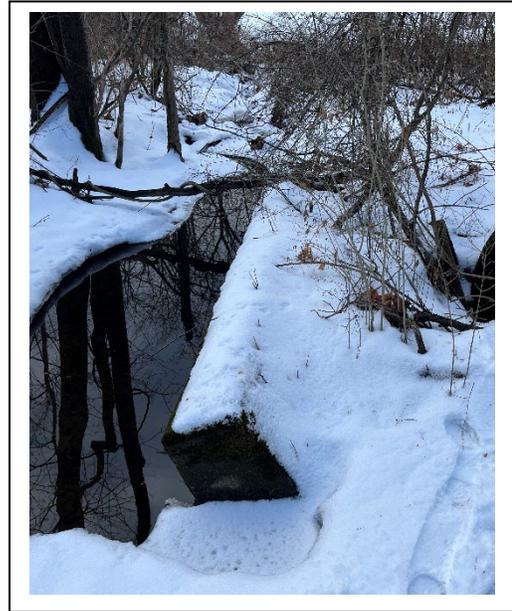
Existing failed drainage headwall at Bloody Brook. Facing south.
